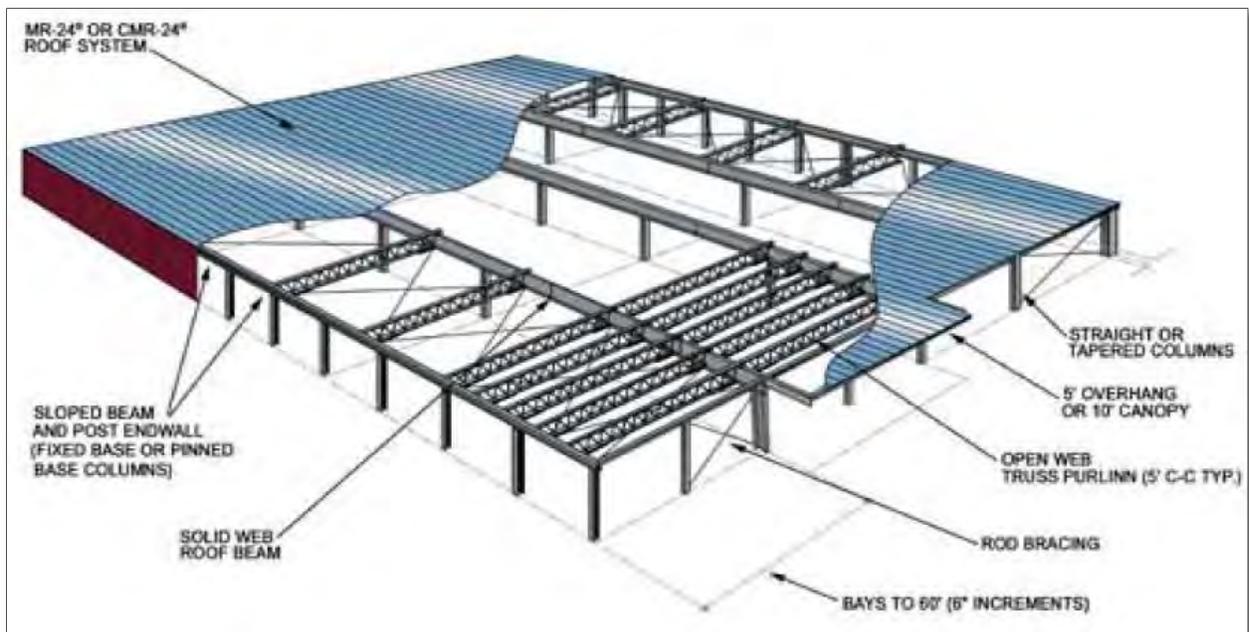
SRBT FACILITY CONSTRUCTION TYPE
